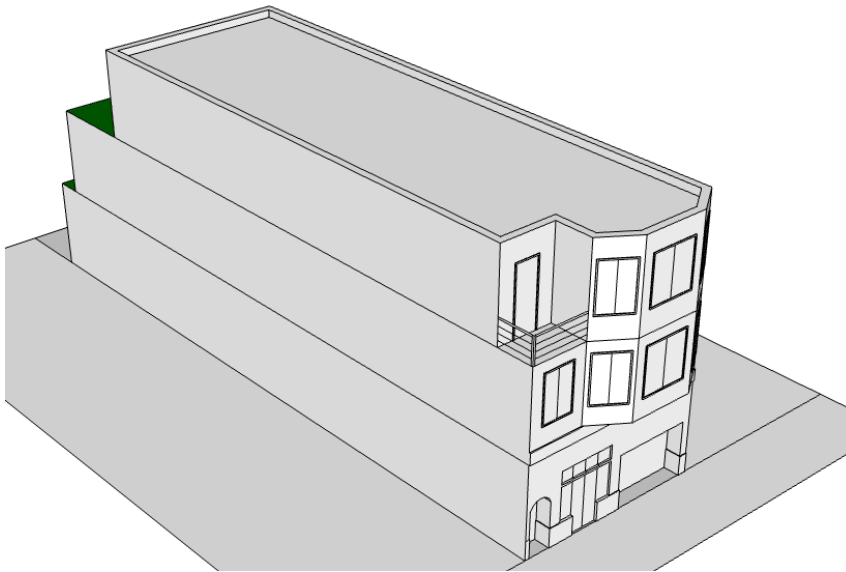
NCRO-2 Building Design Under Proposed Objective Standards
